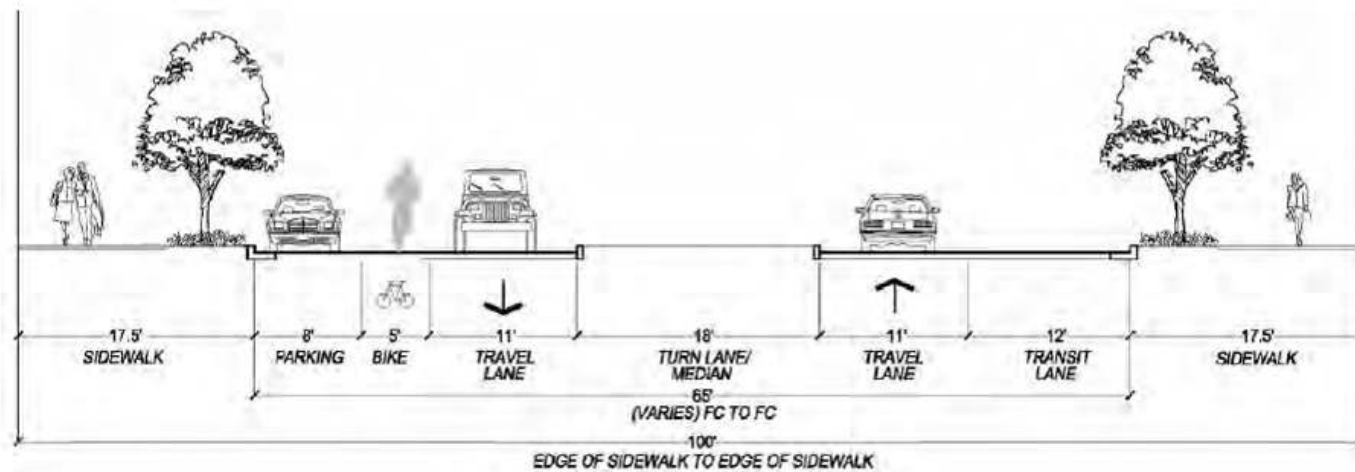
Recommended cross-section for 12th Street S. looking west between Crystal Drive and S. Clark/Bell Street
